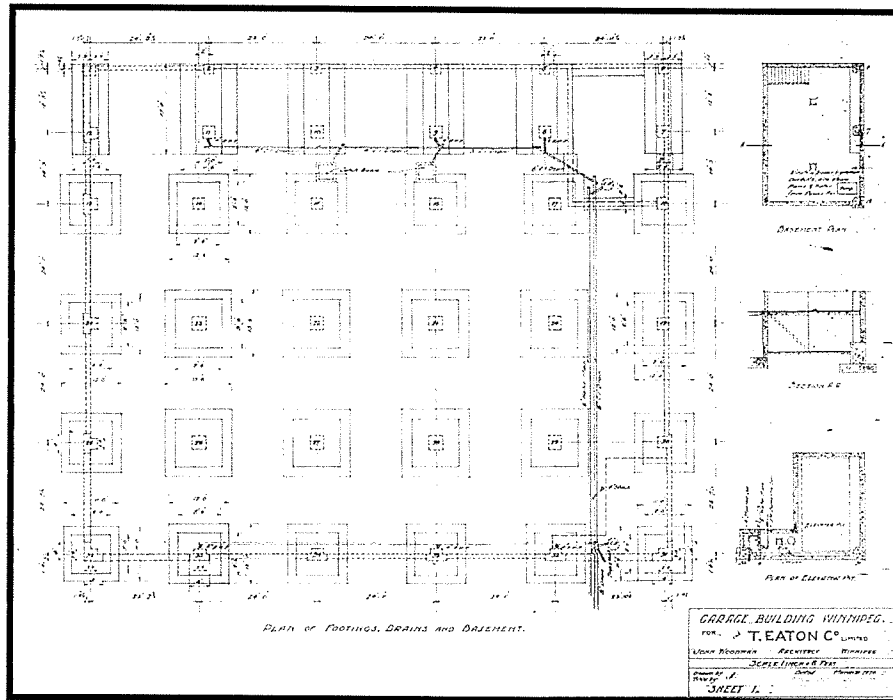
1926 Garage Building, Plan of Footings, blueprint reduced from 1/8"=1', Drains and Basement, compliments of City of Winnipeg Archives.
